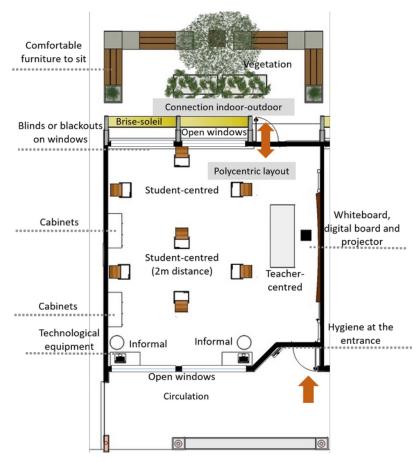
Adapted classroom layout (FNDE, 2020, adapted by authors).
